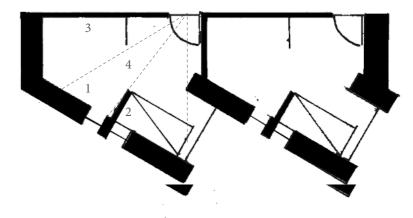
1/ immersion 2/ refuge 3/ bath 4/ floor
